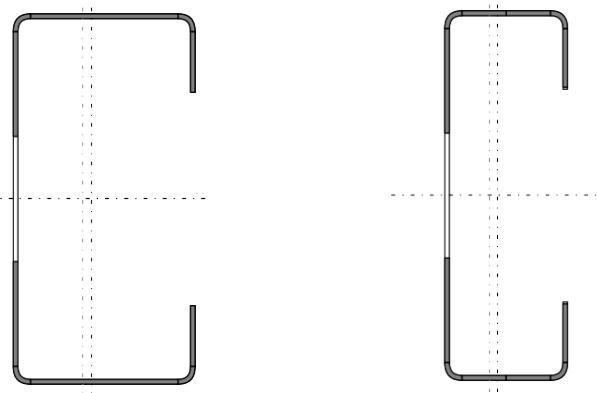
Studied cross-sections: Section A (left) and Section B (right).
